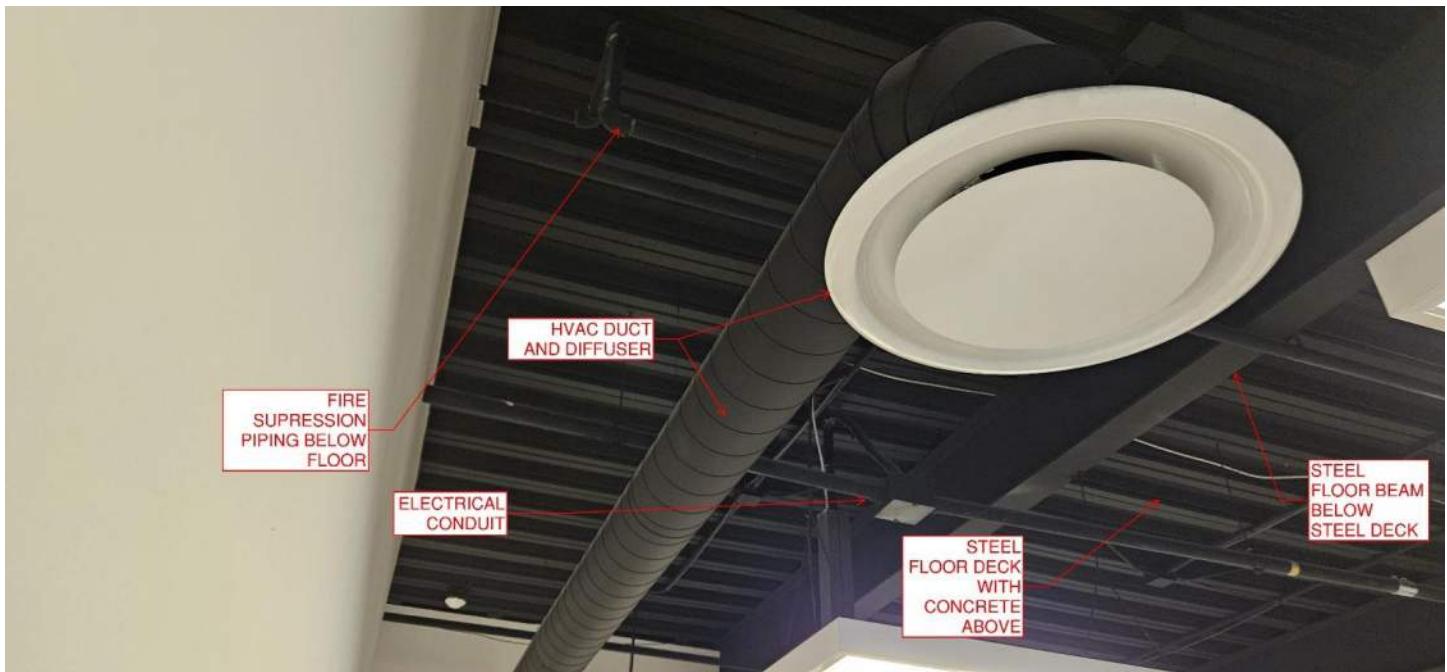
CEILING SPACE ABOVE THE MAIN LEVEL
